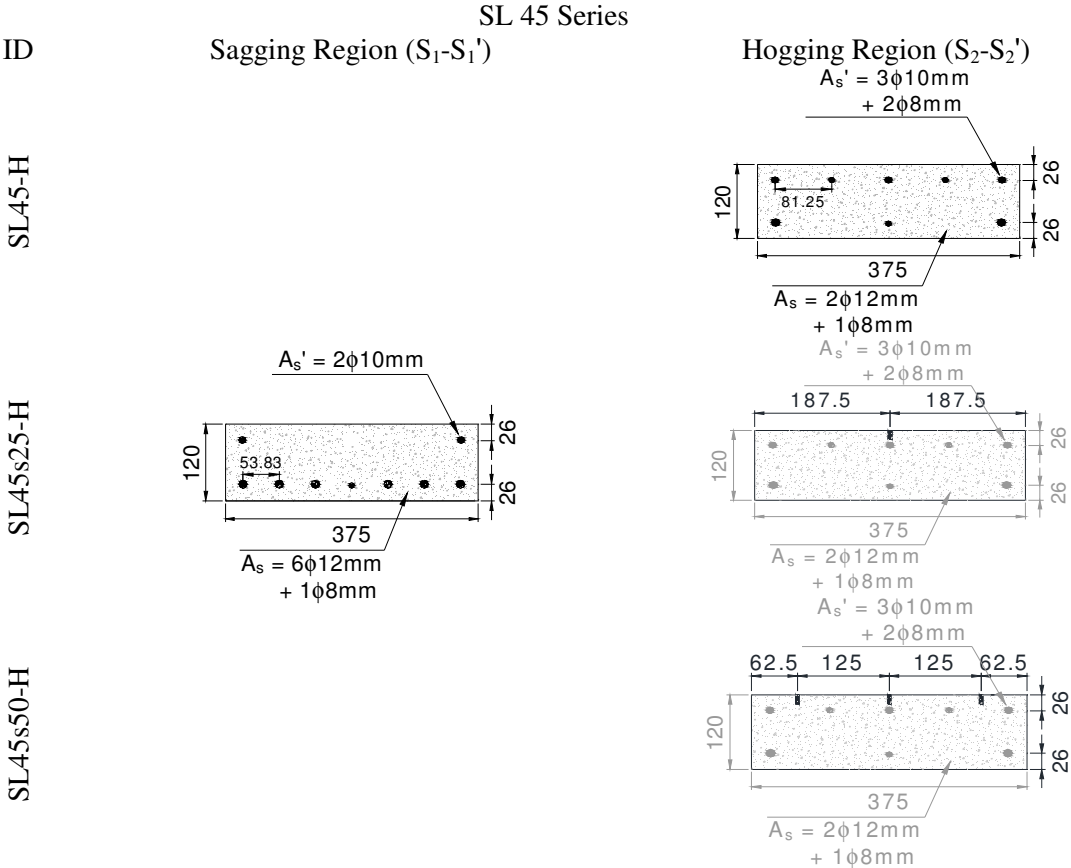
Slab strips of SL45-H Series: specimen's cross-sectional dimensions, reinforcement and strengthening of sagging (S₁-S₁') and hogging regions (S₂-S₂'). Dimensions in mm
